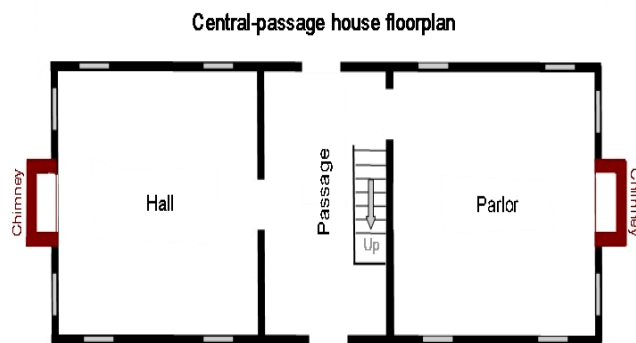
Double Pile, Central-Passage House Floor Plan, typical rectangular floor plan style of neoclassical influence.
